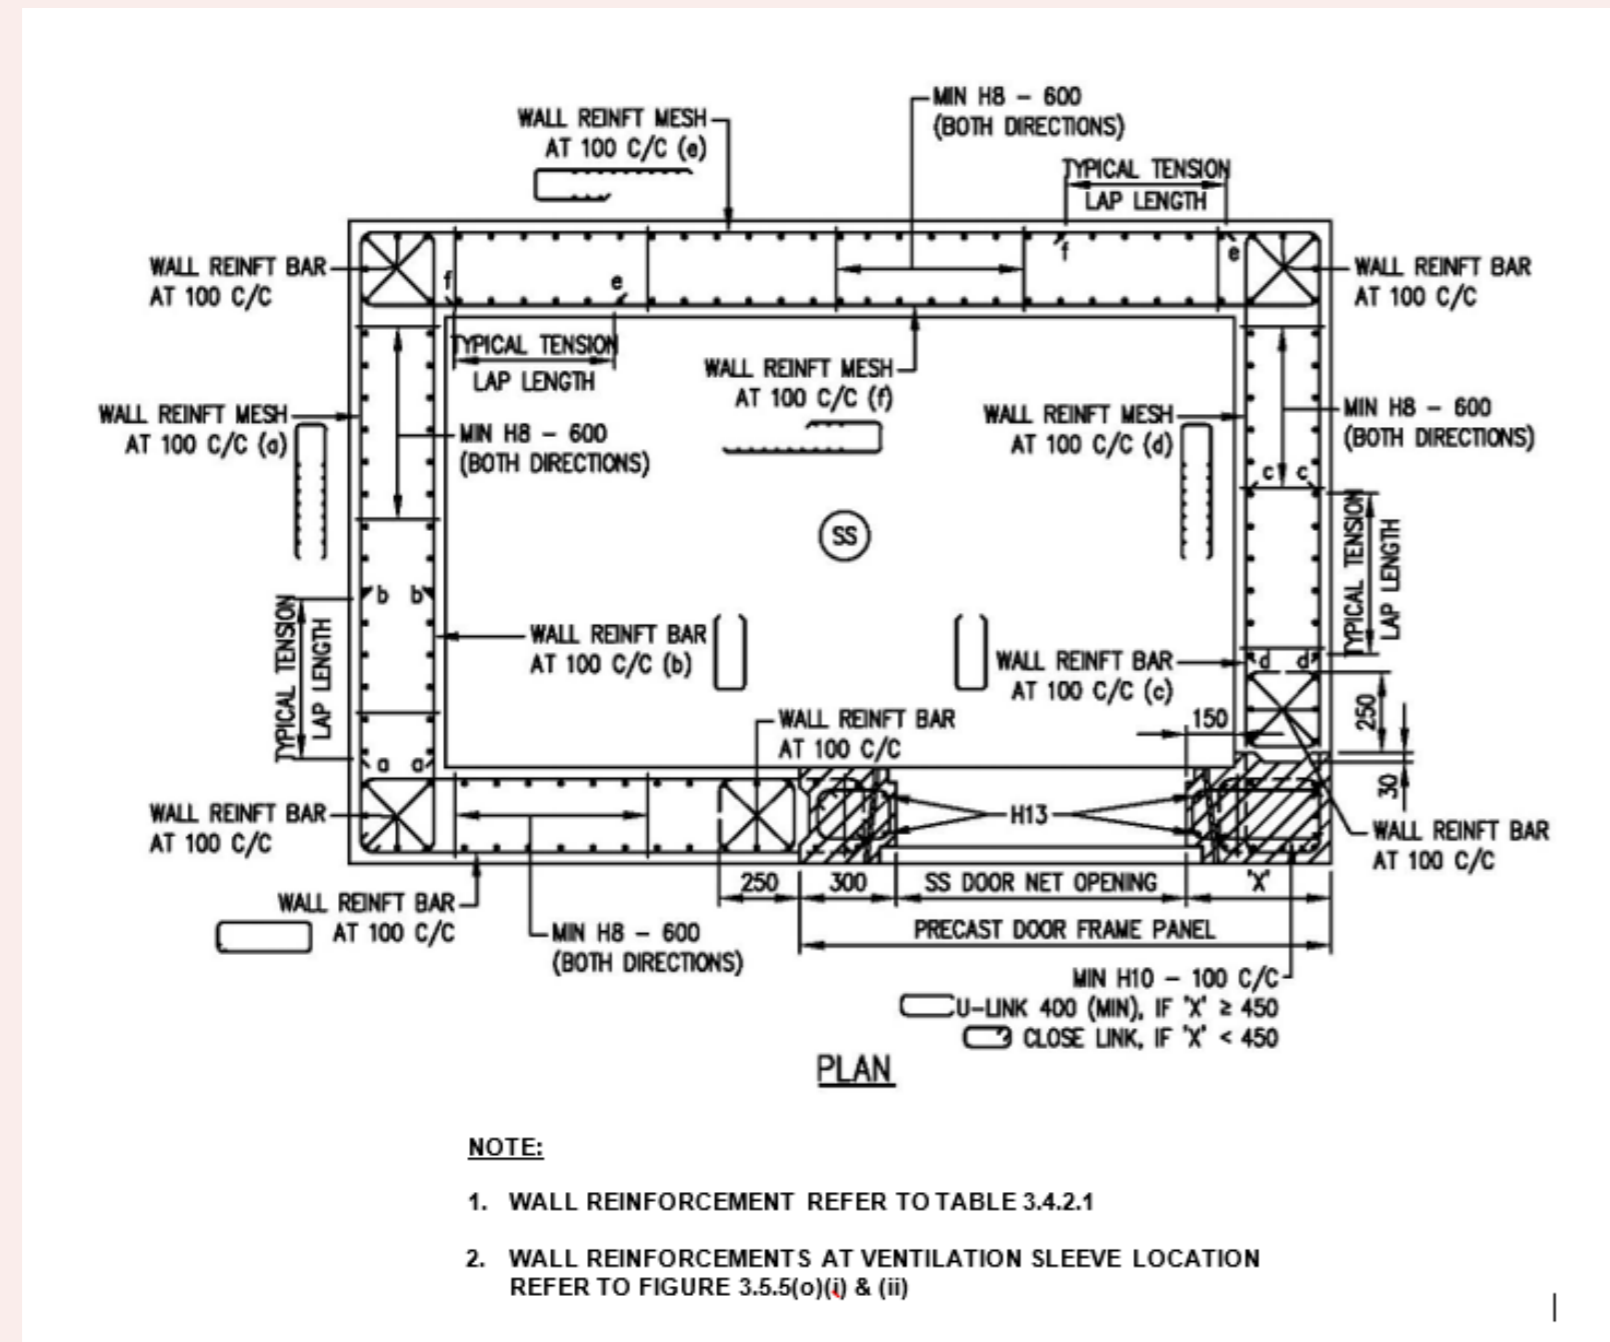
(a): PLAN OF SS WALLS WITH PRECAST SS DOOR FRAME PANEL (TYPE 1)
